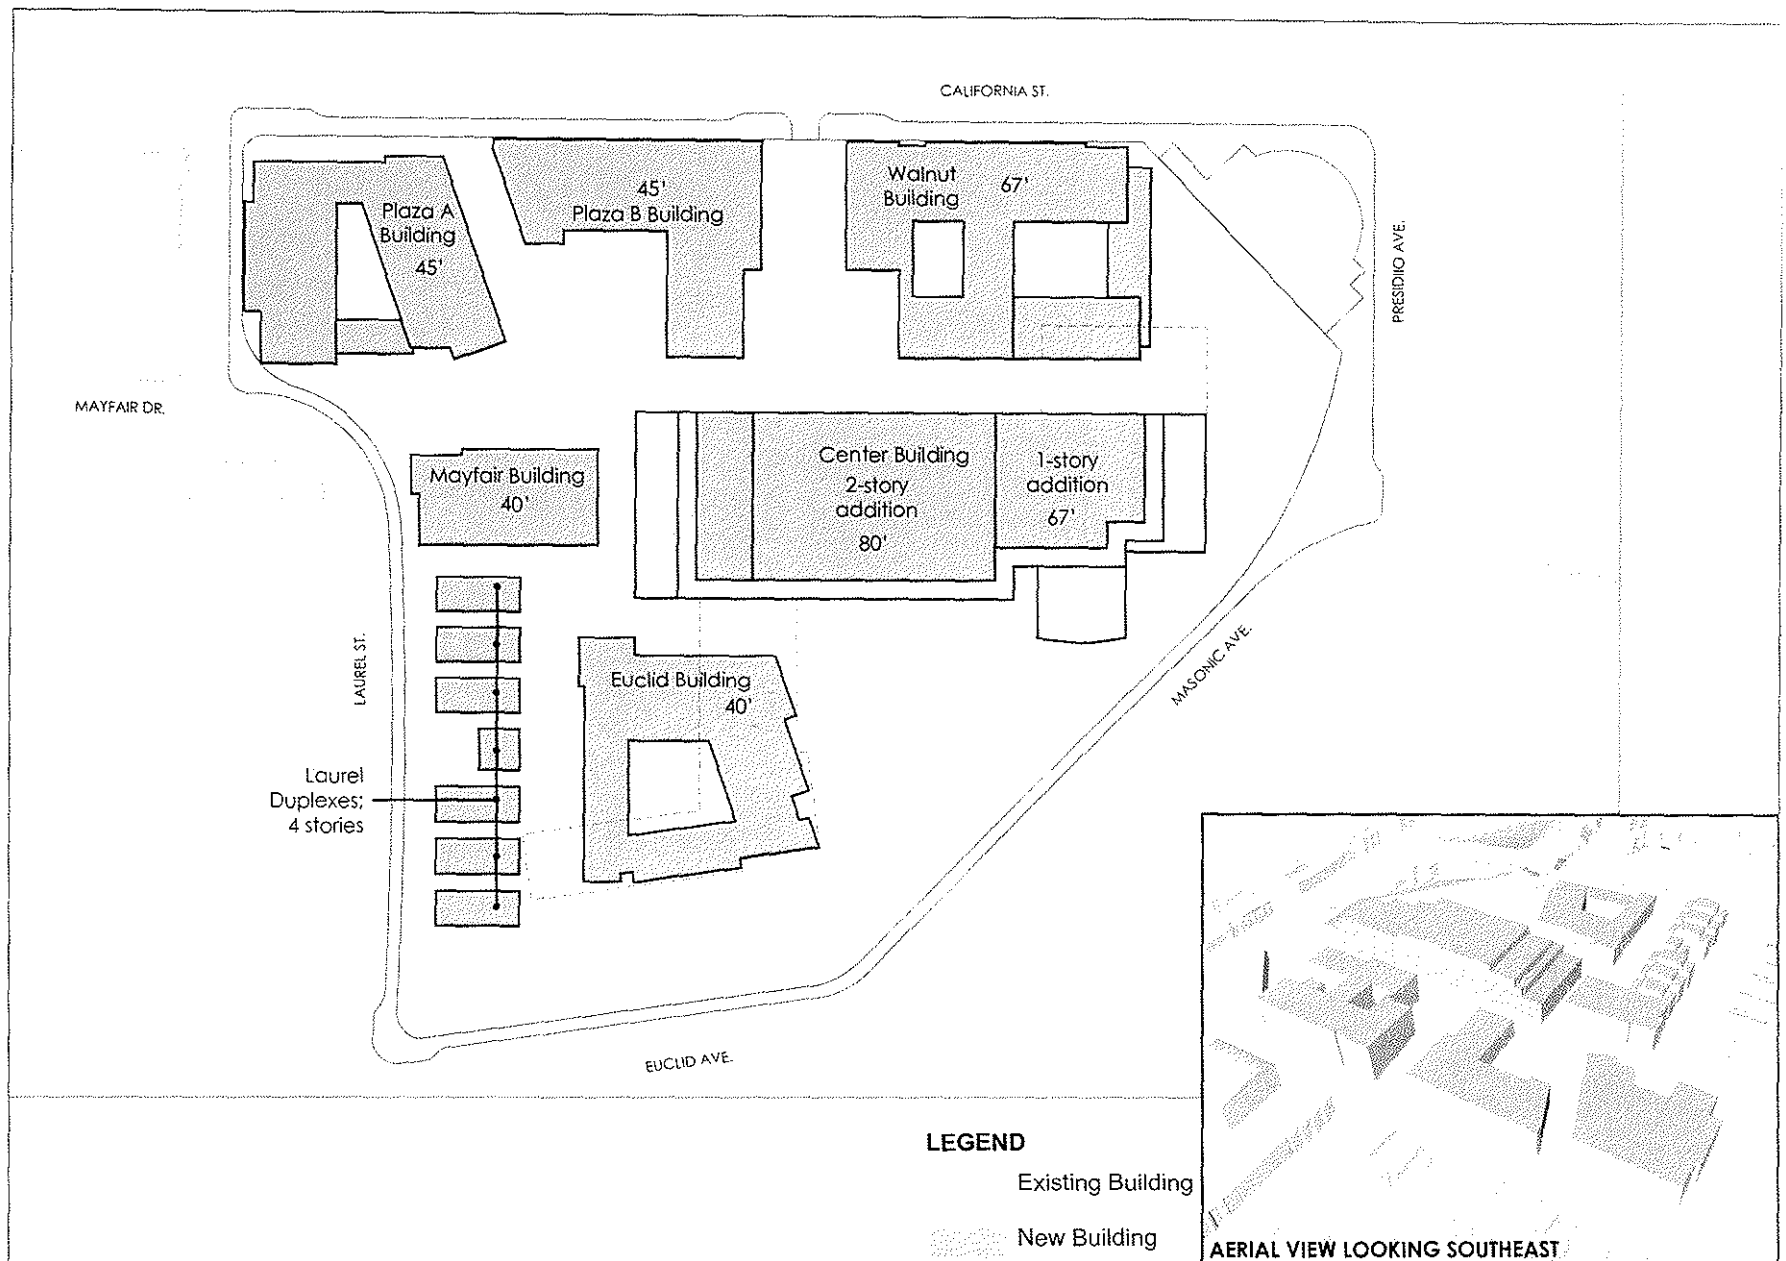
ALTERNATIVE C: FULL PRESERVATION - RESIDENTIAL ALTERNATIVE SITE PLAN
